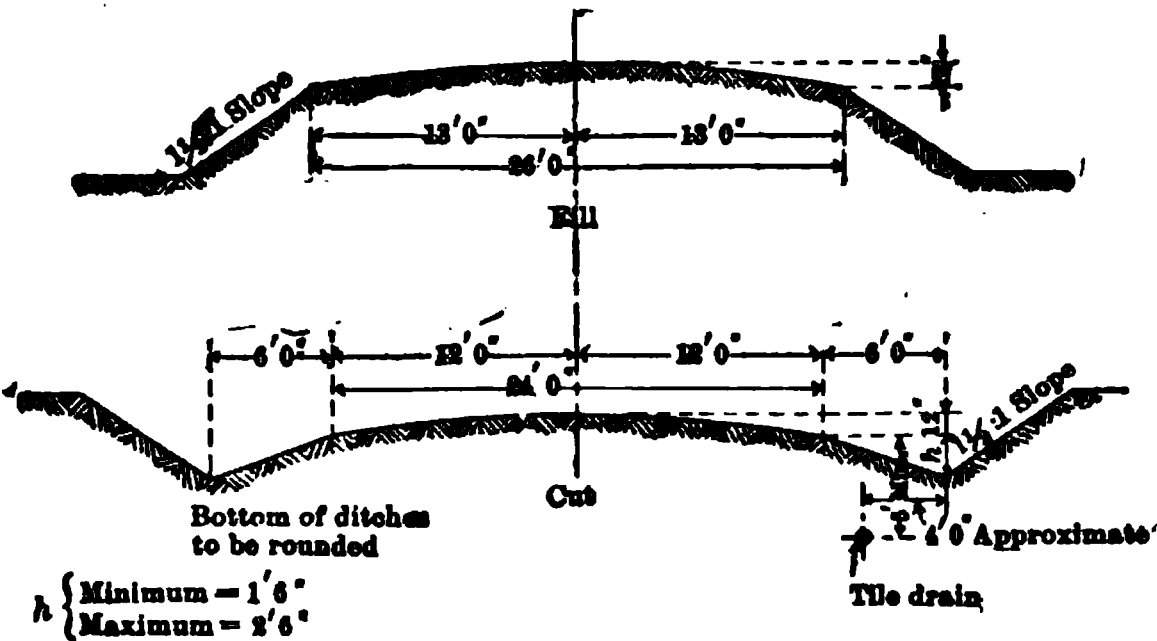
Iowa State Highway Comm. Standard Cross-Sections for Earth Roads
